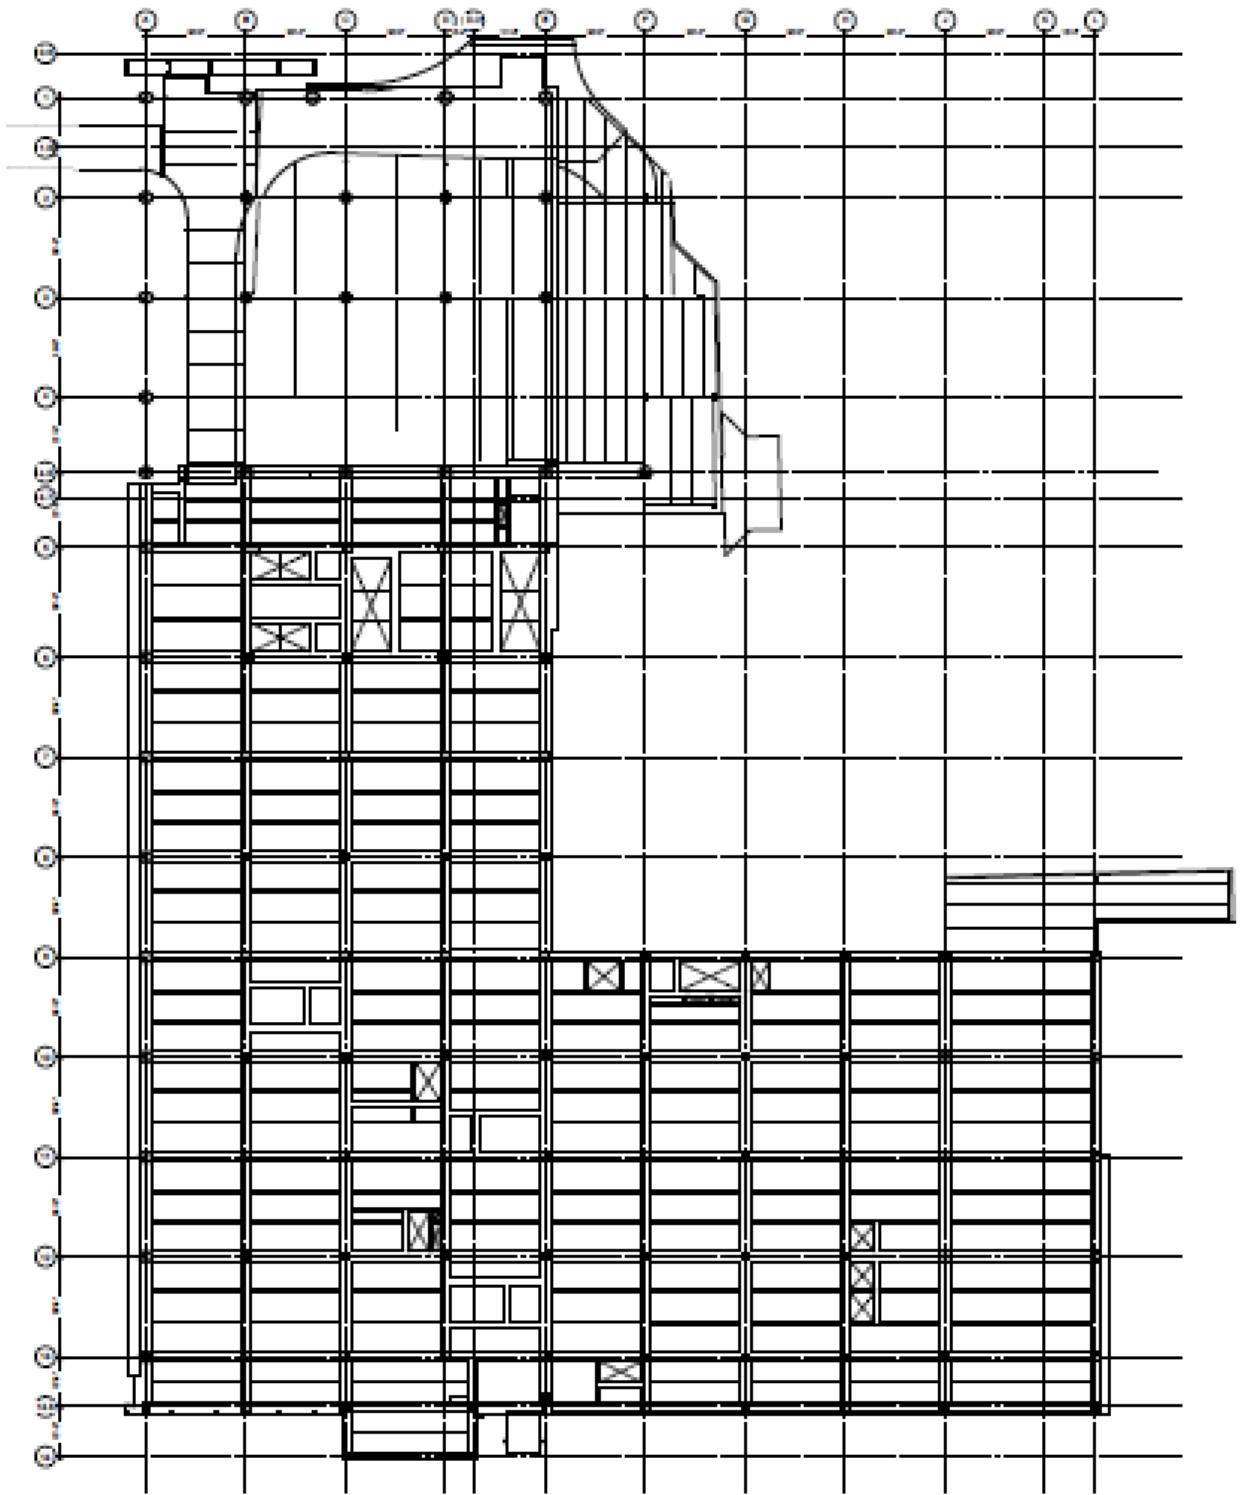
| Typical Structural Floor Plan for Floors 1-3 (Walter P. Moore)
